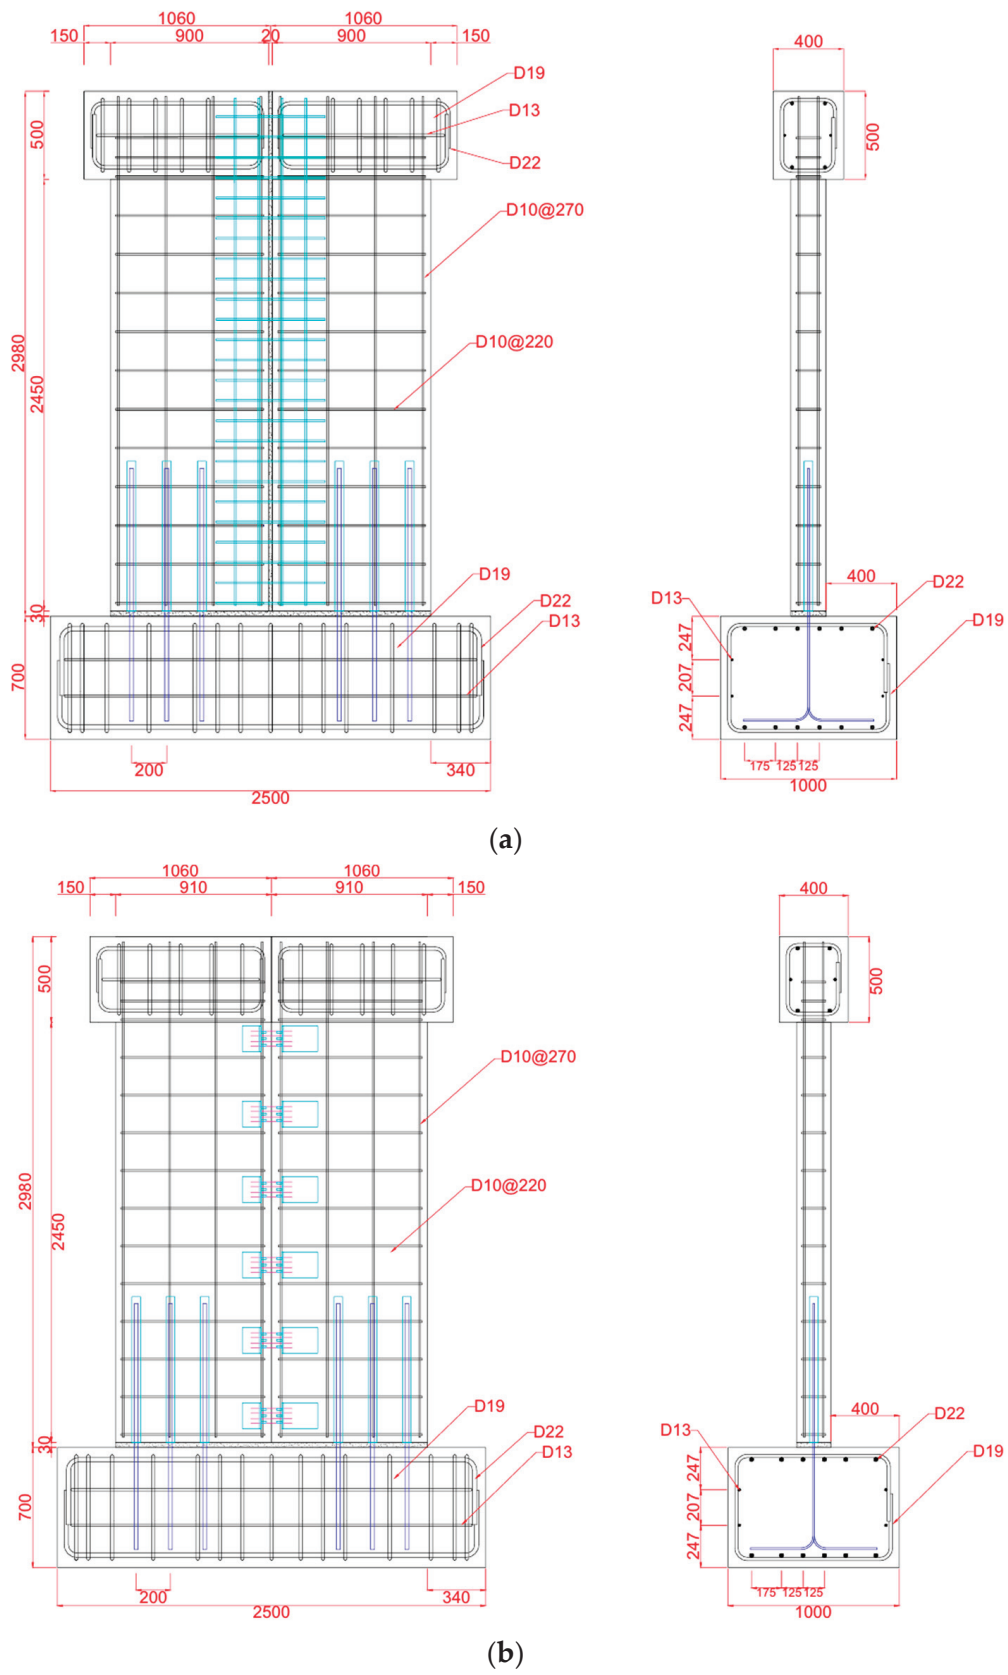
Elevation and section of specimens—cyclic tests (unit: mm): (a) C-PWR; (b) C-PWB.
